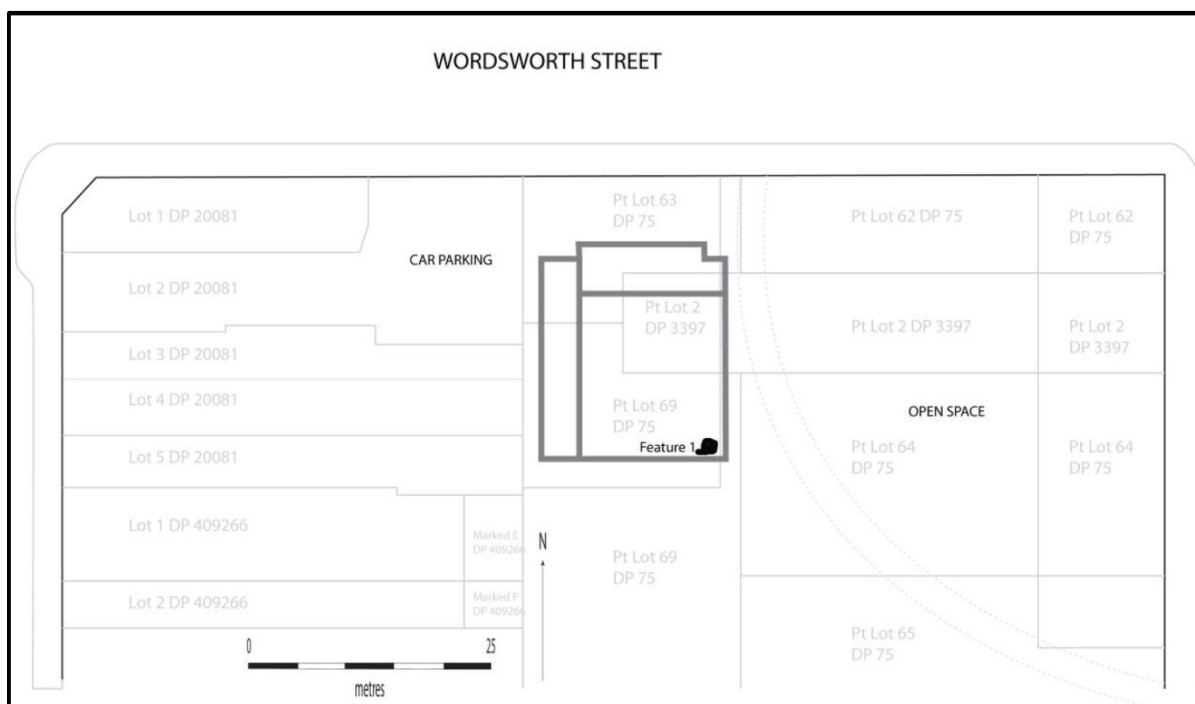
Plan of the area subject to monitoring, showing archaeological features and (concrete footings in grey).
